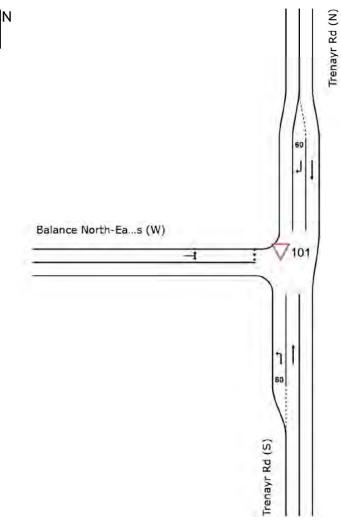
SIDRA Intersection Layout of Trenayr Road / South Site Access (Intersection 3)
